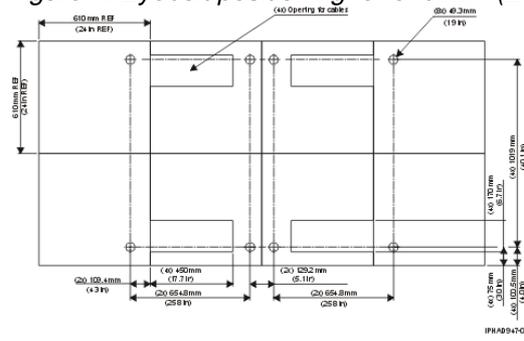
Eyebolt positioning for 600 mm (23.6 in.) floor tile layout
